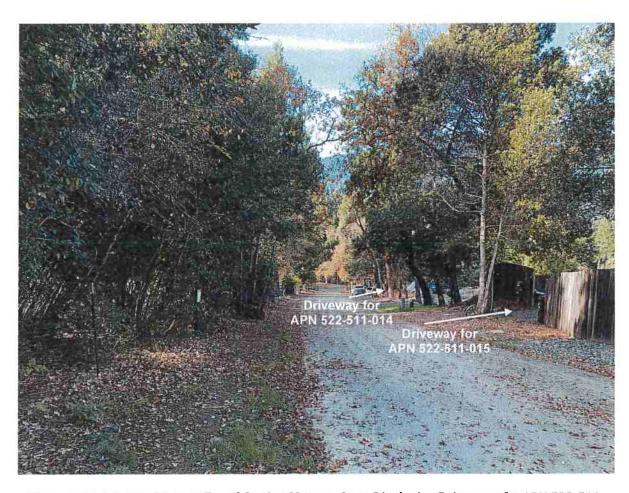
Facing West on Paved Section Moonset Lane Displaying Driveways for APN 522-511-014 and 522-511-015 with Ample Visibility (Road Width = ± 20 feet).
